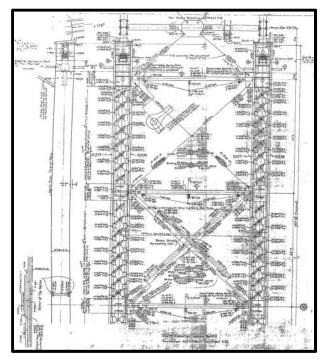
Floorbeam Steel Used as Temporary Bent for Main Span Arch Construction
